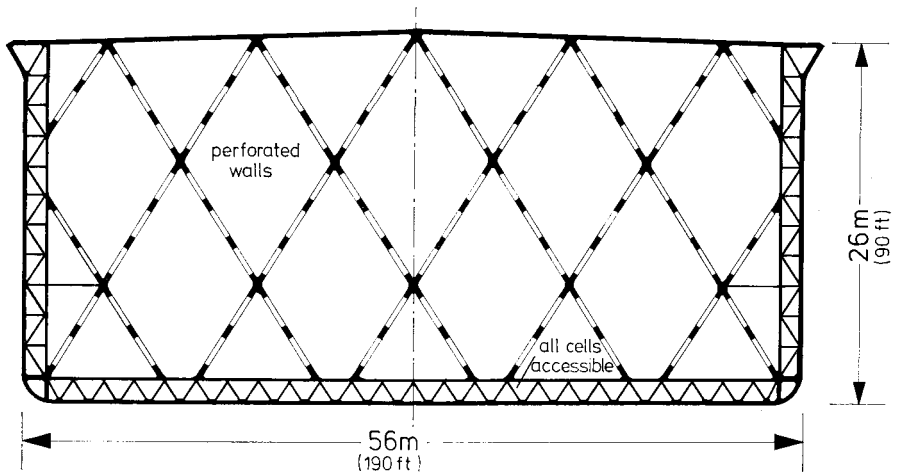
Cross section of prestressed concrete oil tanker; concreted in vertical position with sliding forms; 60-m long segments.
